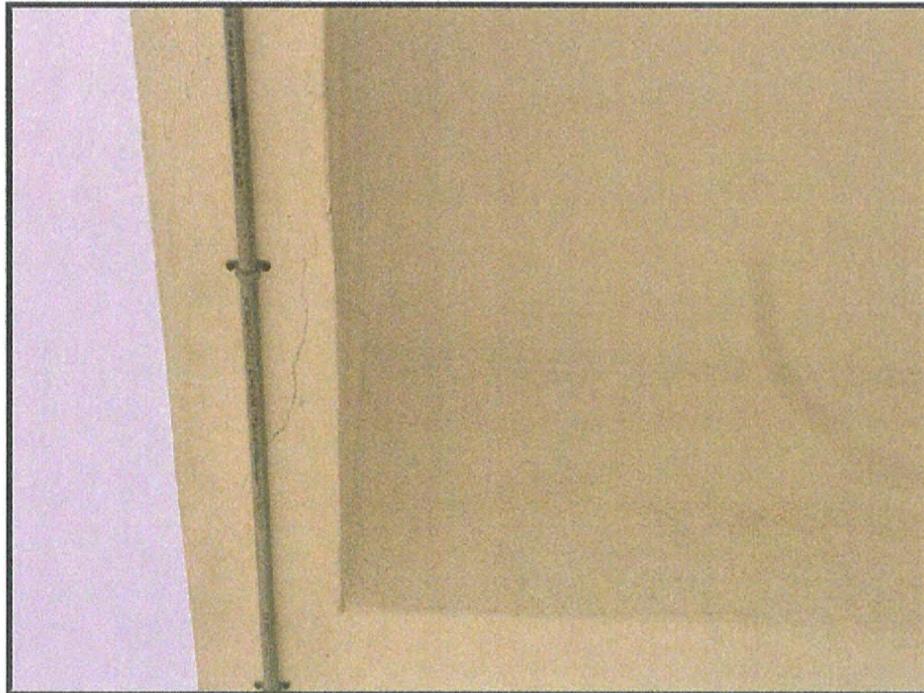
Delamination on bottom face at balcony edge along East side of building.
